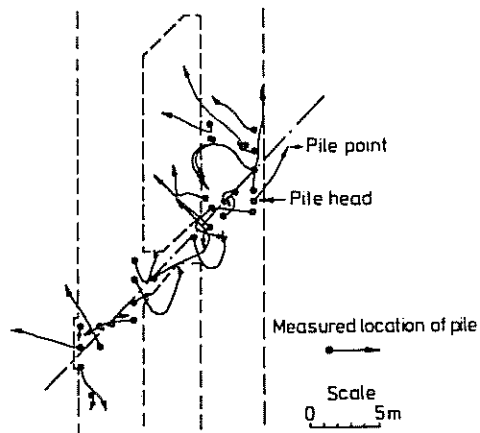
Measured positions of pile top and toe of precast concrete piles for a railway bridge abutment (after Pejrud 1965).
